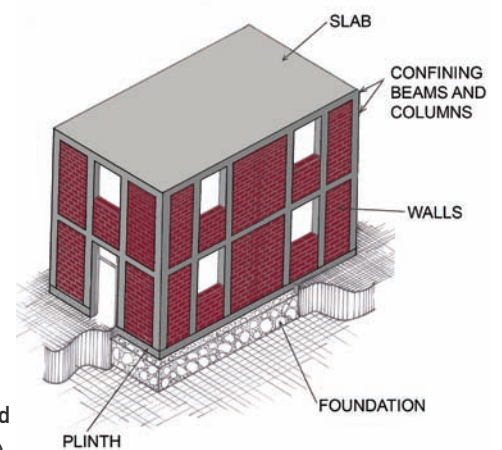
Key components of a confined masonry building (Brzev, 2008).
